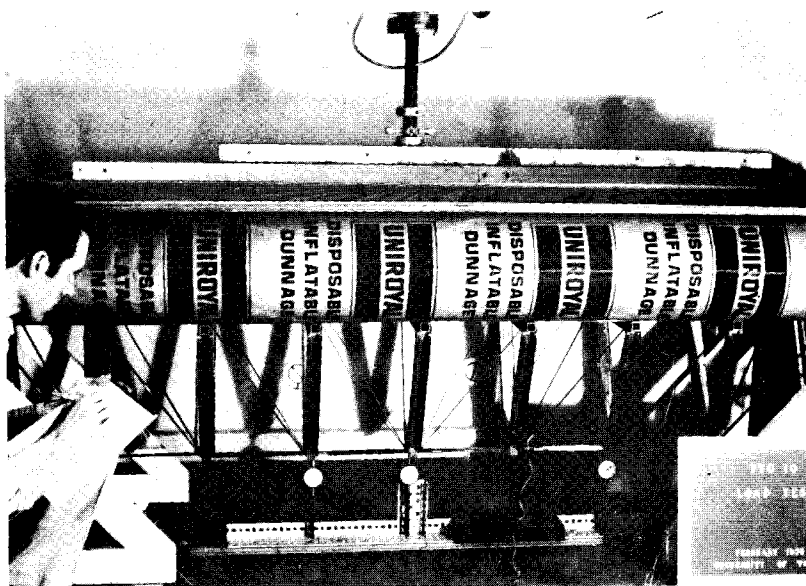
Testing TTG-10 with a uniformly distributed load. A load of 5,500 lb. (515 psf) was required to cause failure.
